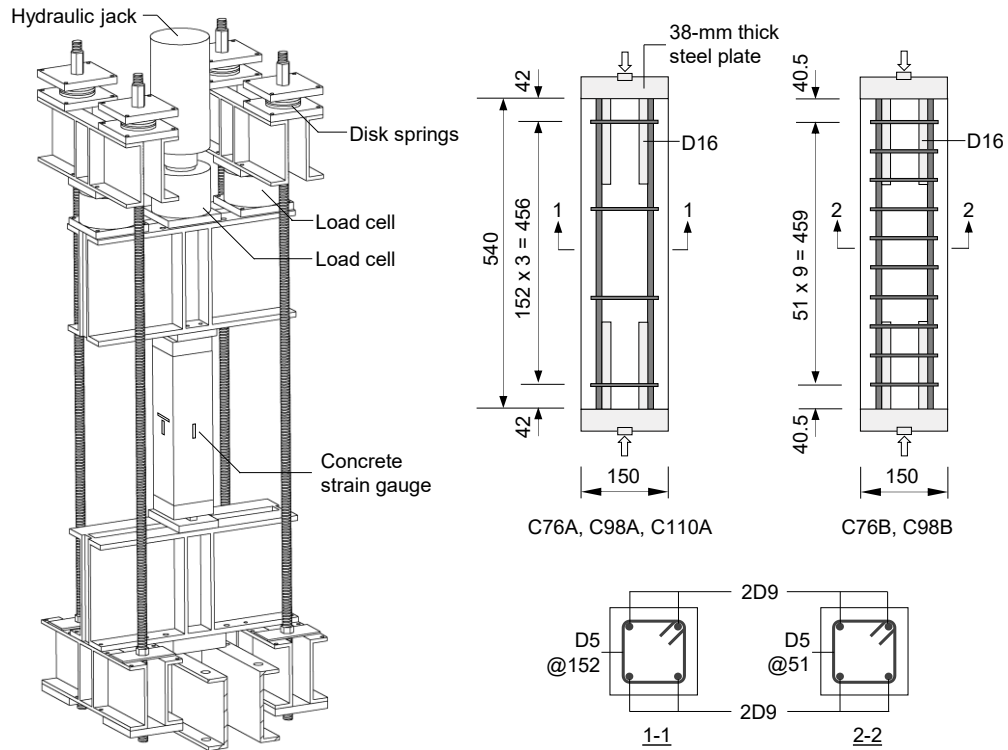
Test setup and reinforcing detail for concentrically loaded columns (dimension in mm).
